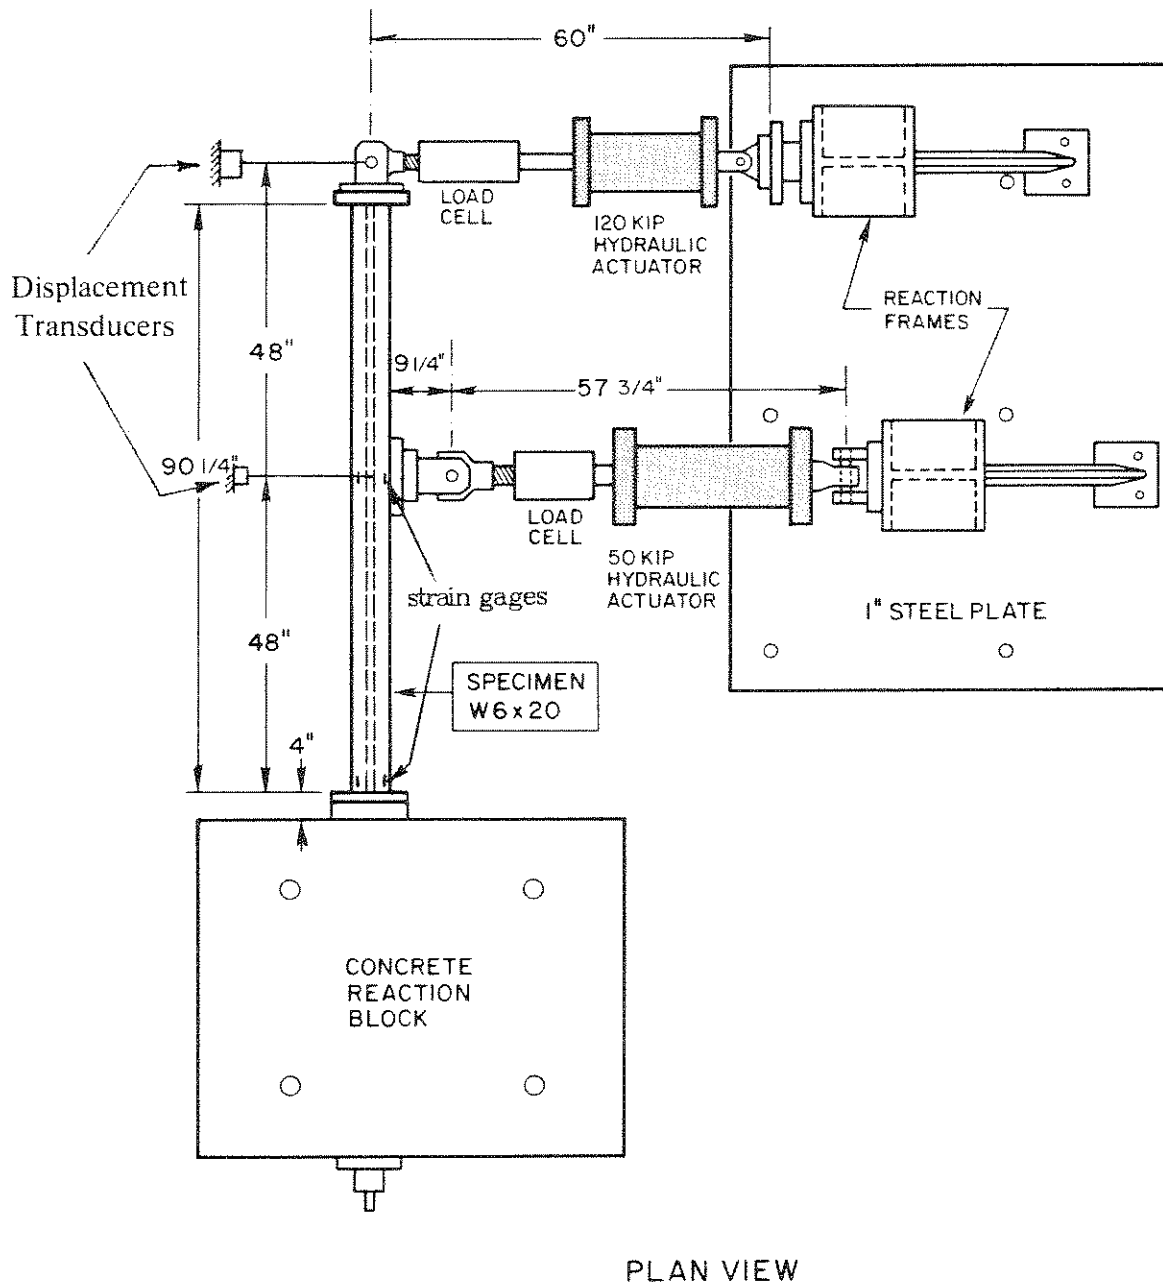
Plan View of the Two-Degree-of-Freedom Test Layout
